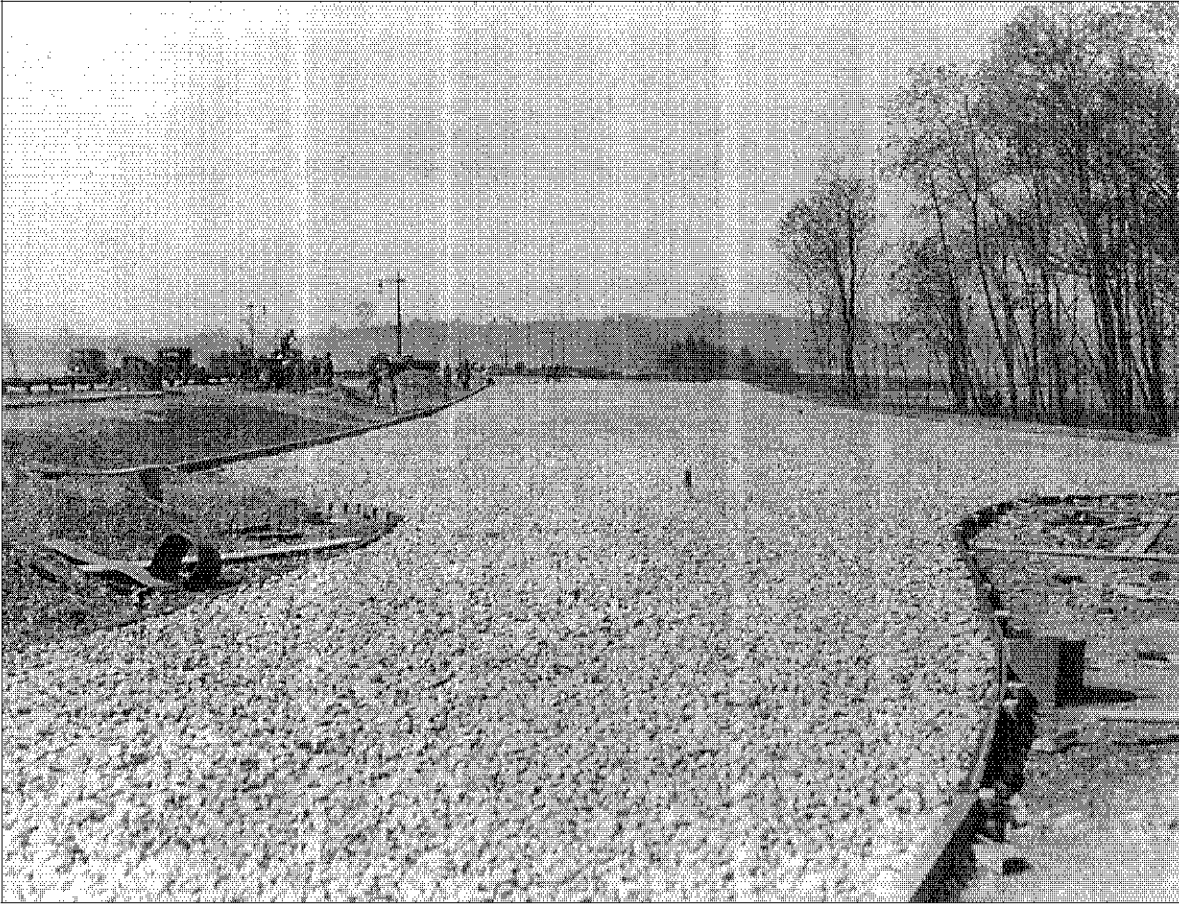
Parking area at Roaches Run Bird Sanctuary while under construction, 1935.
